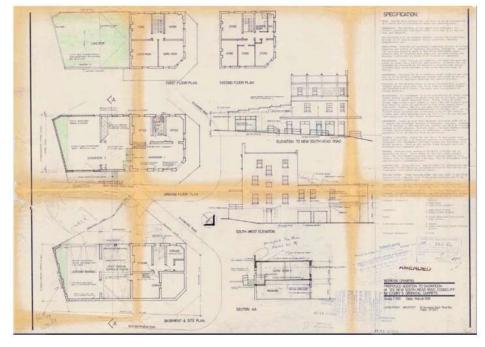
BA419/81 which approved works to the ground floor level showroom.
